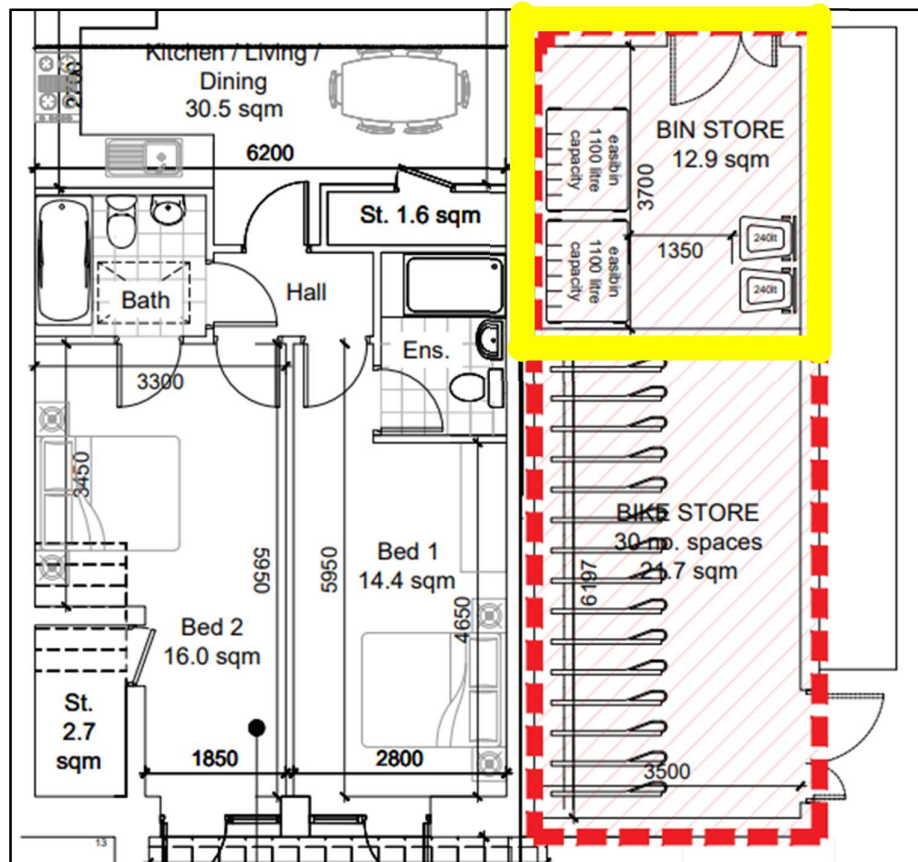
Location and internal layout of Waste Storage Area for Duplex Block B2 (Yellow) (MCORM, 2025)
